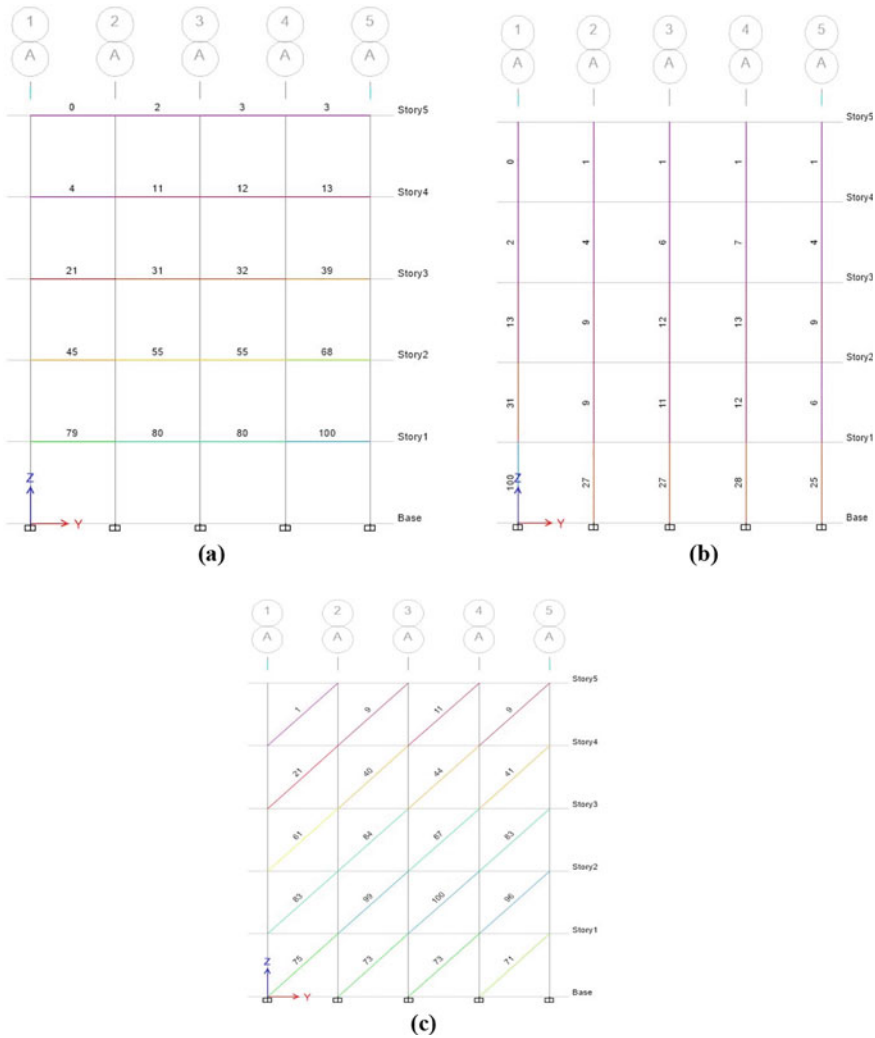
PSO case NME for a beams b columns c bracings/strut
